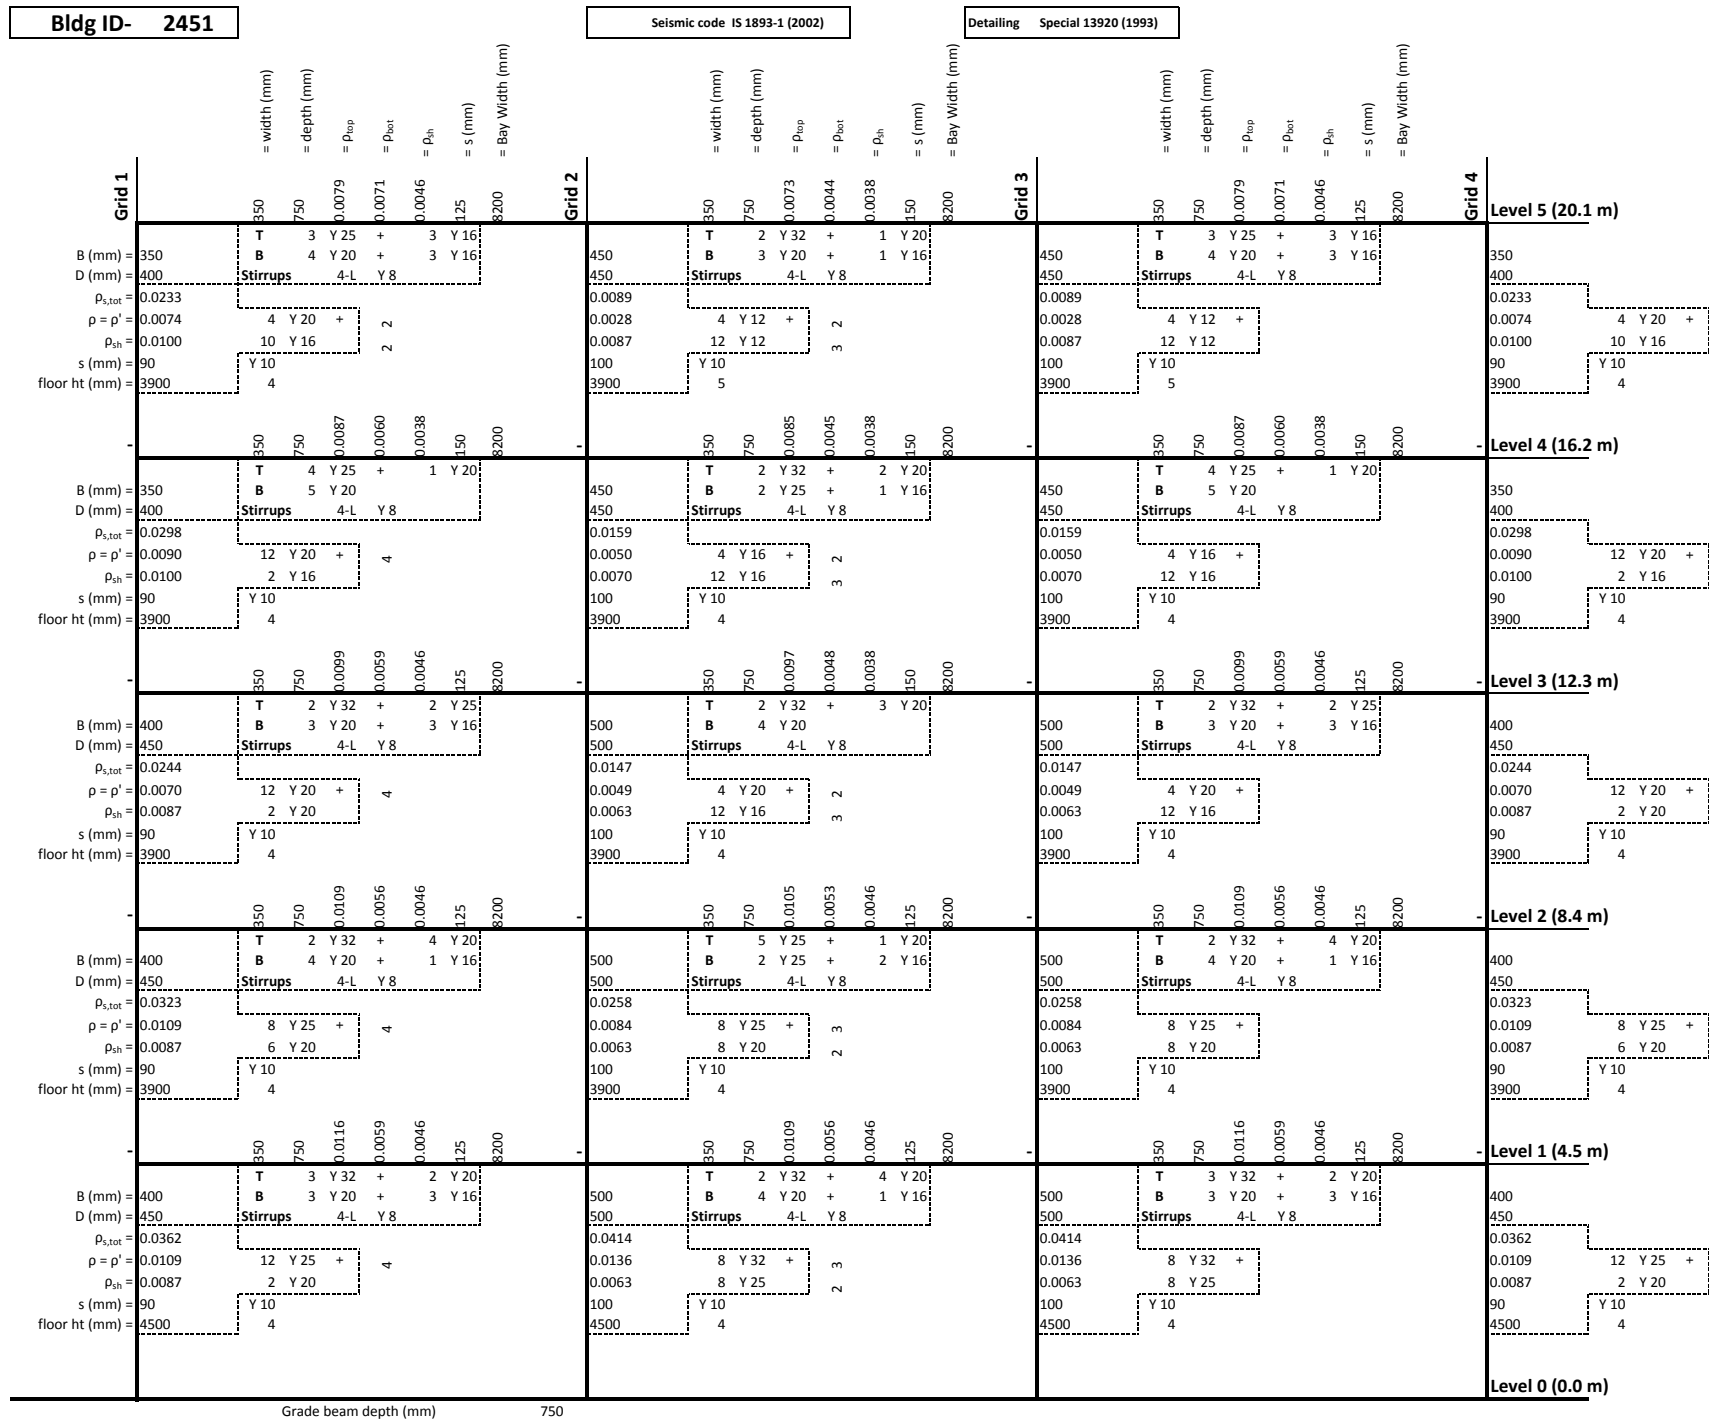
Provided reinforcement and modeling details for building ID 2451
